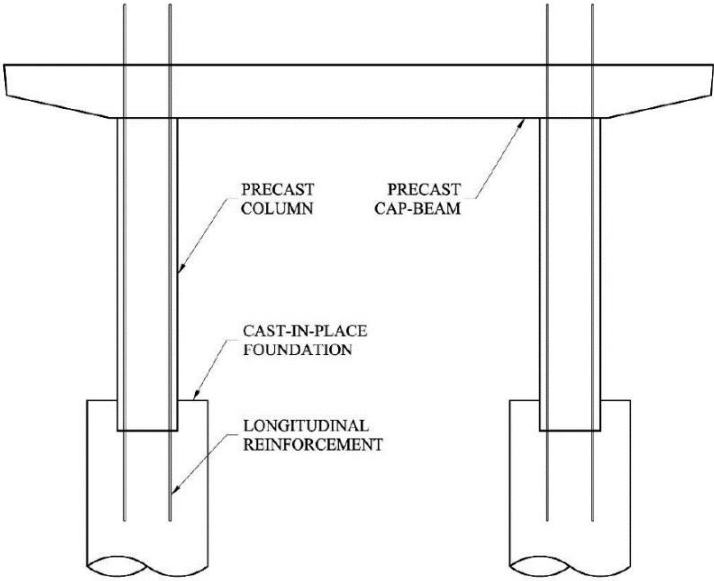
Reinforced concrete precast column system proposed by Hieber et al. (2005)
